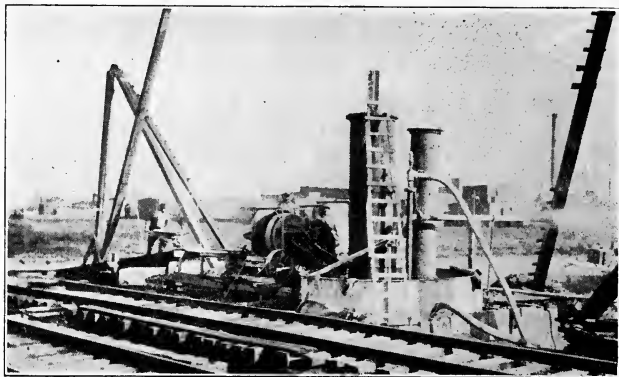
GENERAL ARRANGEMENT FOR SINKING CAISSON.
